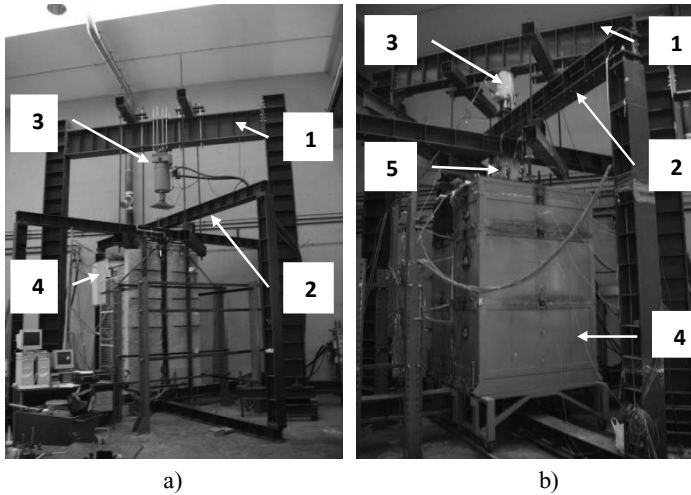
Experimental set-up a) columns embedded on walls b) isolated columns
